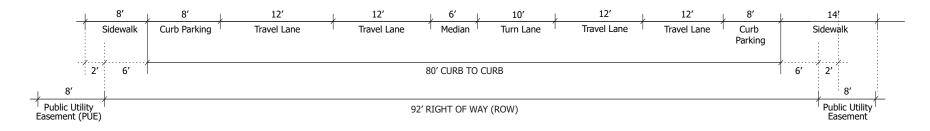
Cherry Avenue/Grundy Lane - Streetscape Concept with Sharrow looking South
